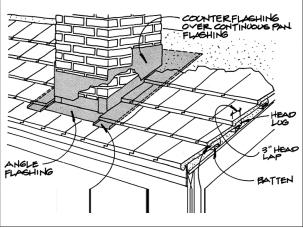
This drawing shows how the flat tiles' head lugs fit over the battens on each course. Batten layout should allow for a lap of three inches. With flat tiles, chimney flashing is typical, although continuous pan flashing is often used instead of step flashing at the sides of the chimney.
